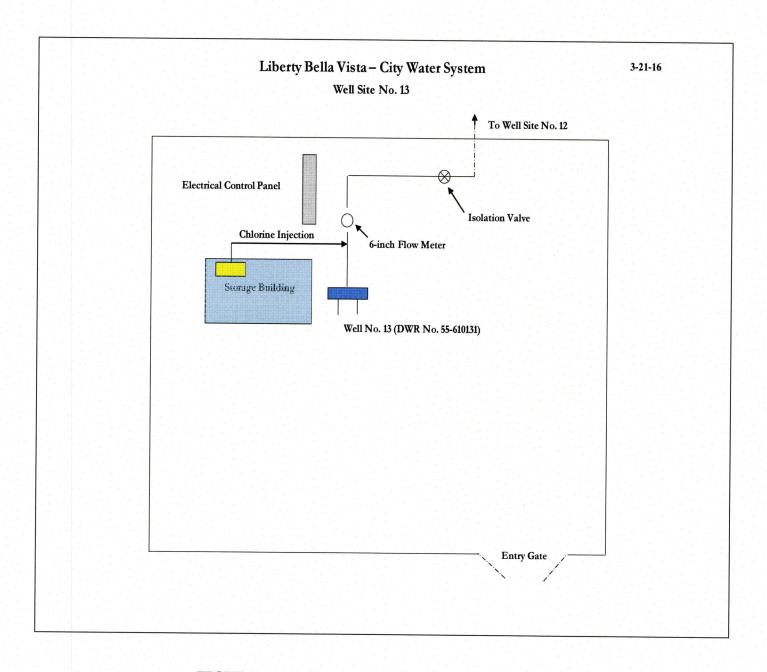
CITY WATER SYSTEM WELL SITE NO. 13
